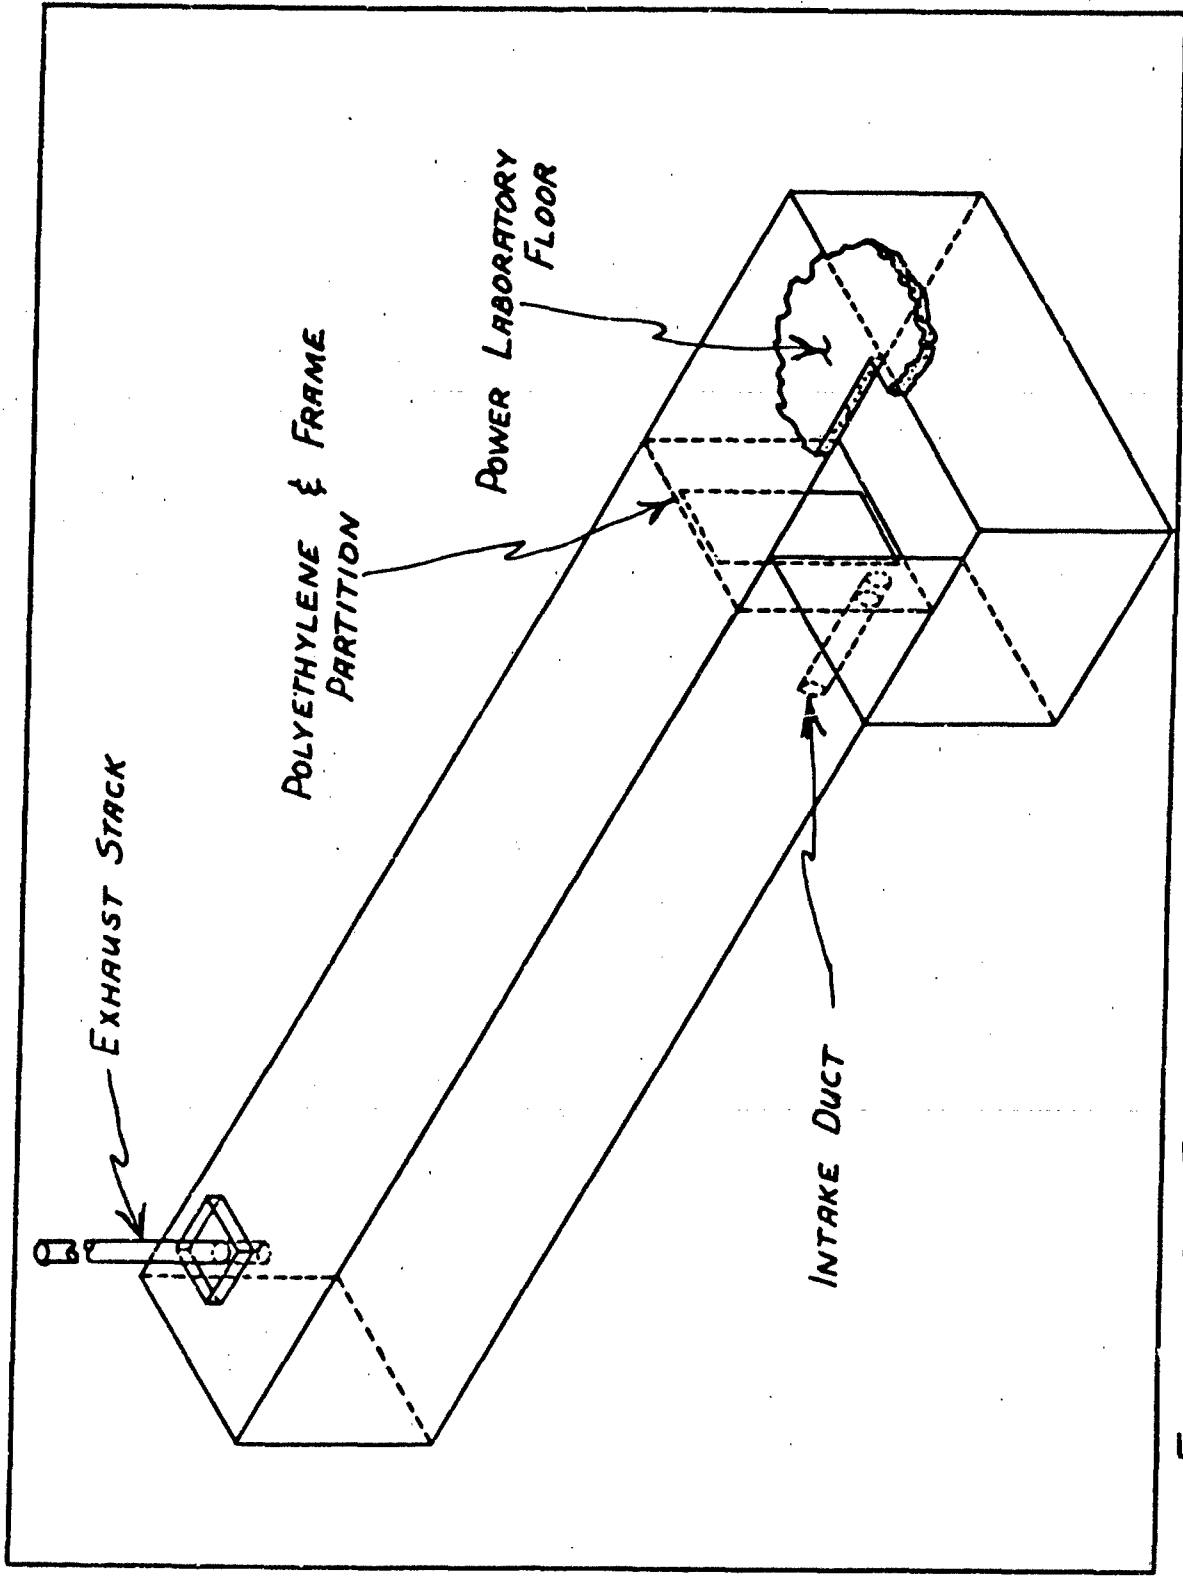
FALLOUT SHELTER TEST FACILITY
